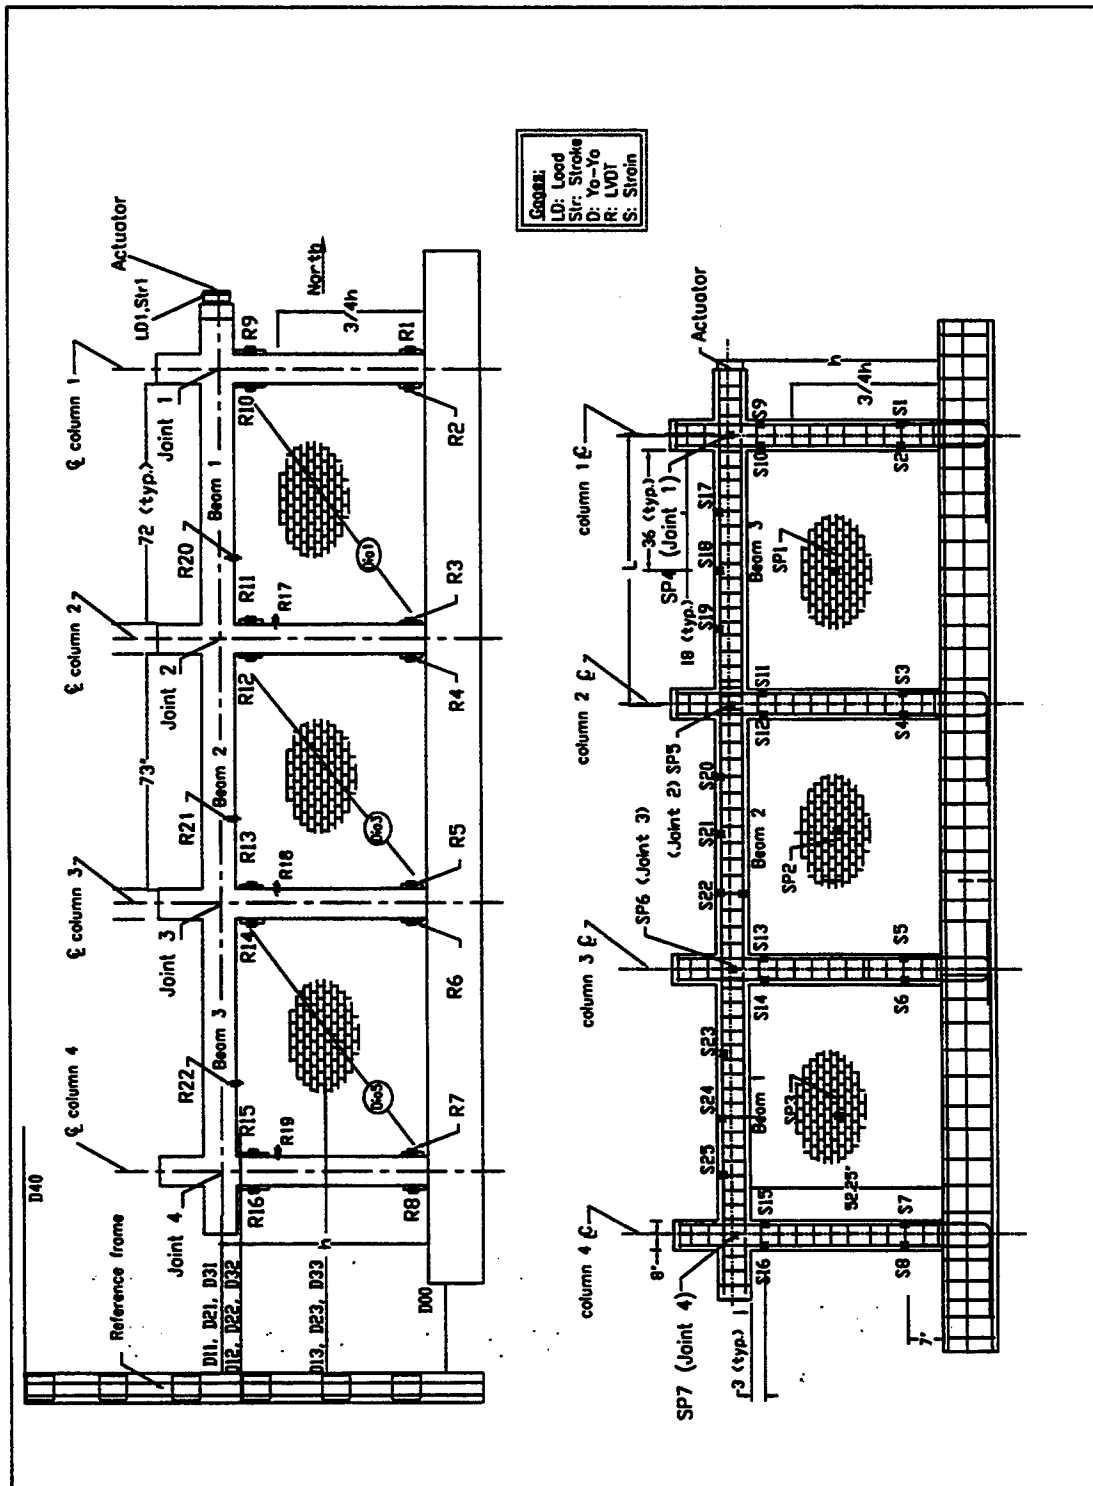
Reinforcement Details and Instrumentation Plan for the CMU Three-Bay Specimen
